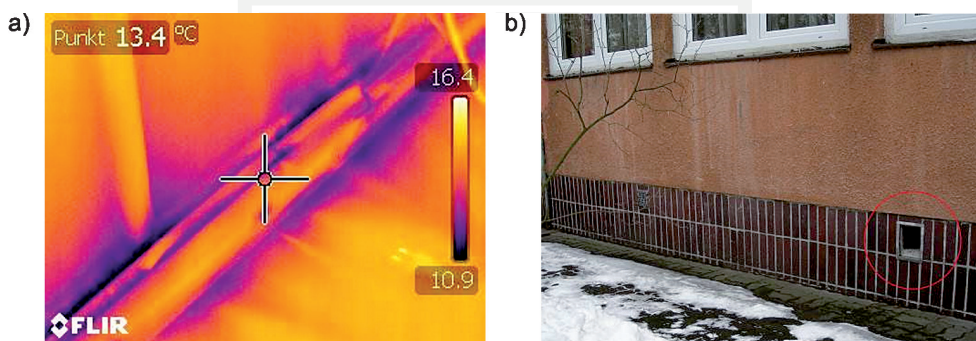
Leaks: a) at connection of external wall with floor and their source, b) ventilation space under the floor – marked the vent in the socle
